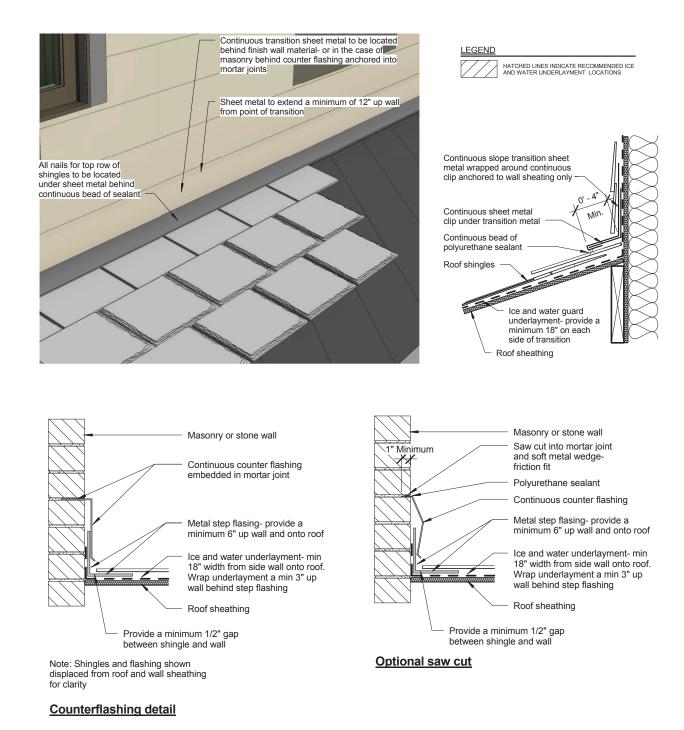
COUNTER FLASHING AT MASONRY (Also Drawing 10.1)
